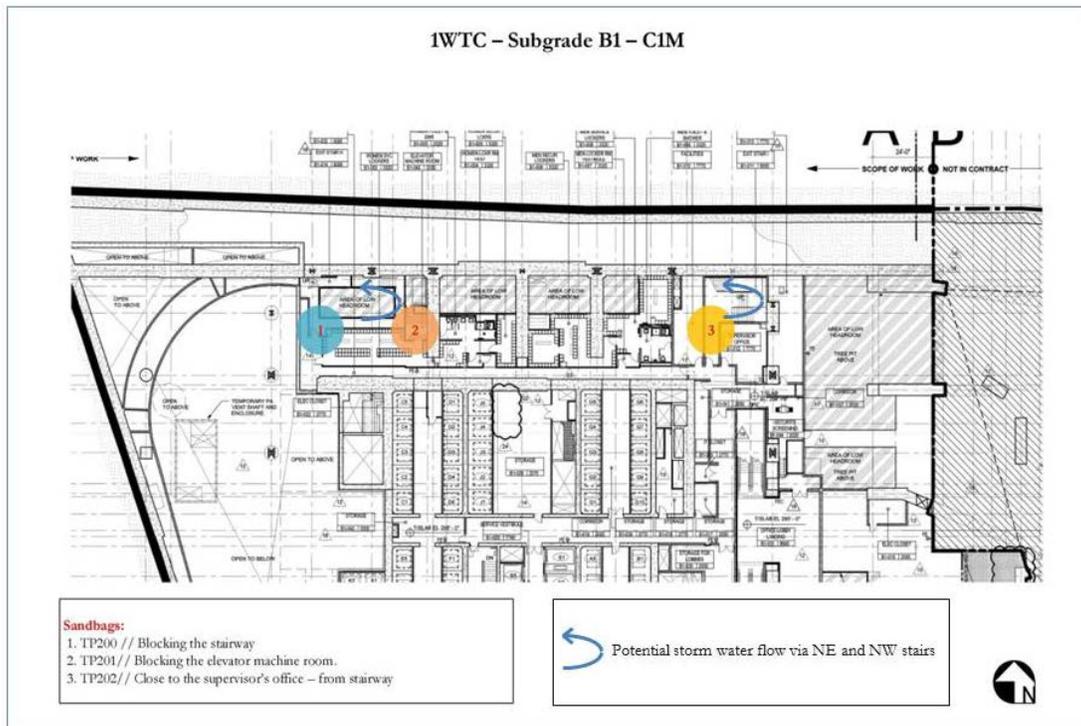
Subgrade Barrier Plan for 1WTC, Floor C1M
